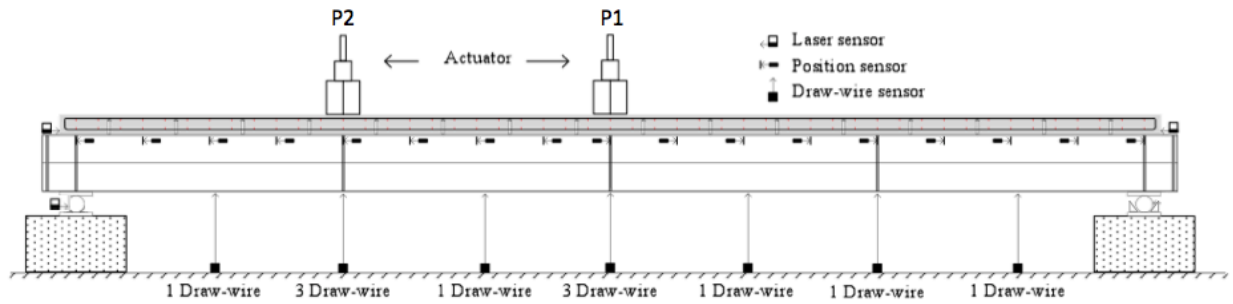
Draw wire, laser, and piston type (position) displacement sensor layout
